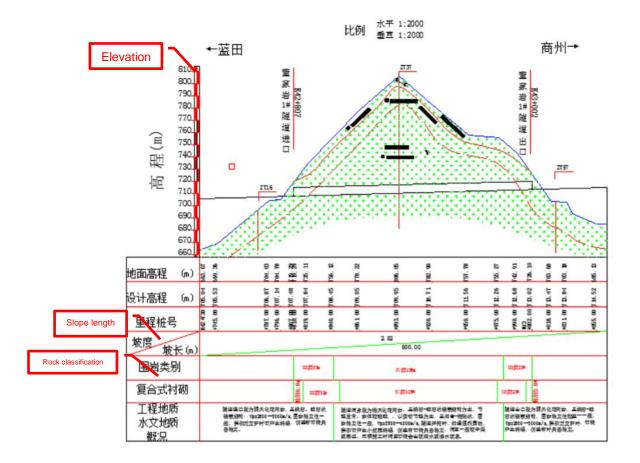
Section drawing of surrounding rock and masonry structures [21].
